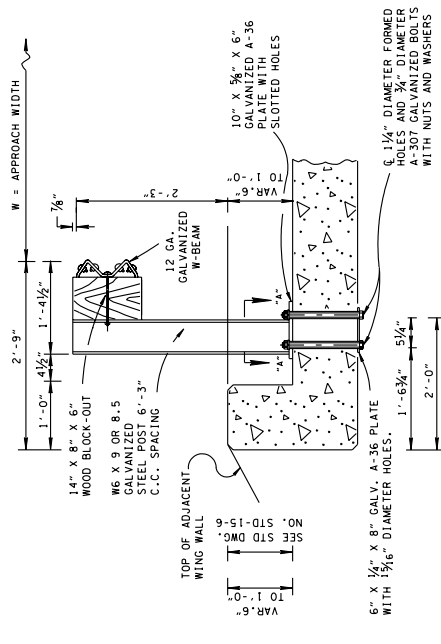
DETAIL FOR CONCRETE DECK USED AS A RIDING SURFACE SHOWING OUTLET END
